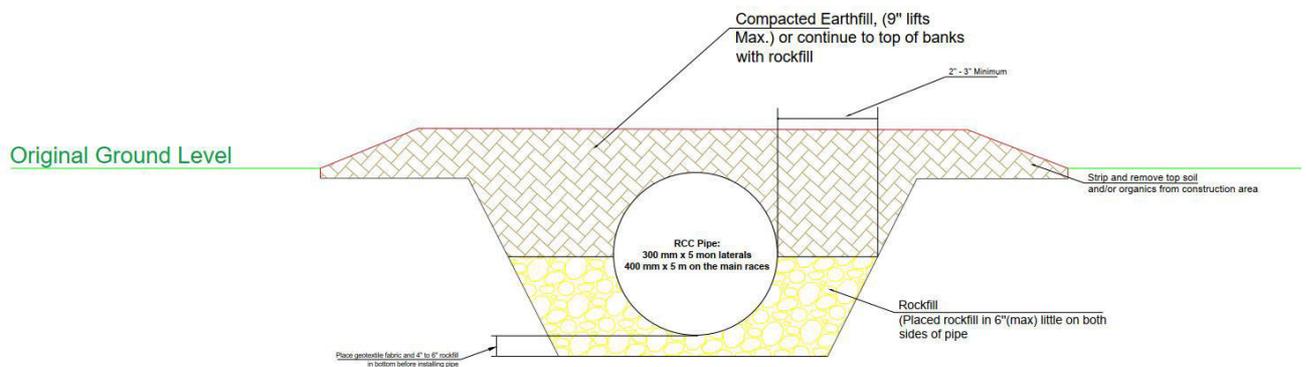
Cross section of proposed crossing. (Source: FNSF, 2022).
